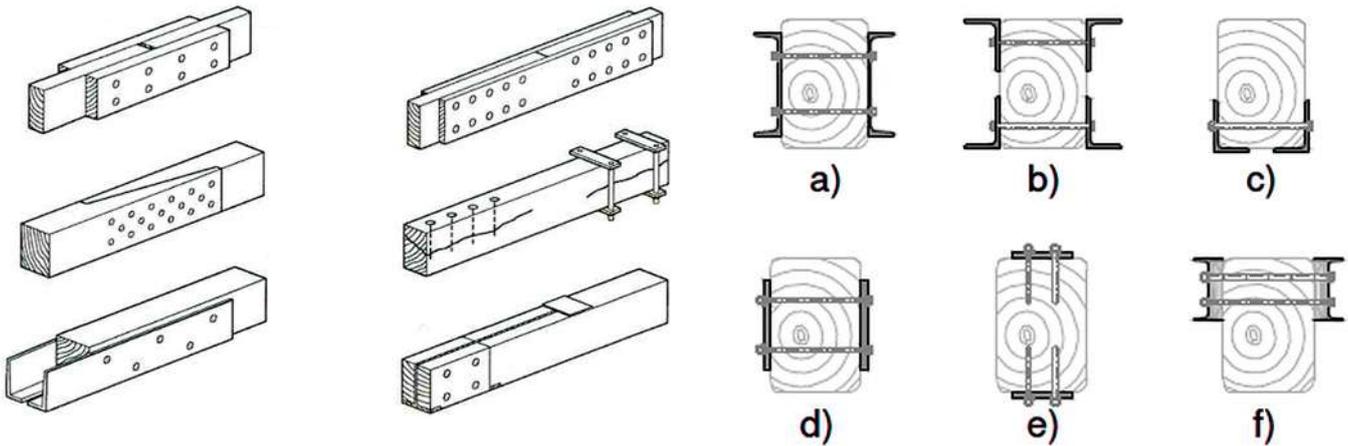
Repair or reinforcement of timber members using new timber elements or steel plates and sections connected to the original timbers by metal fasteners [13, 4].
